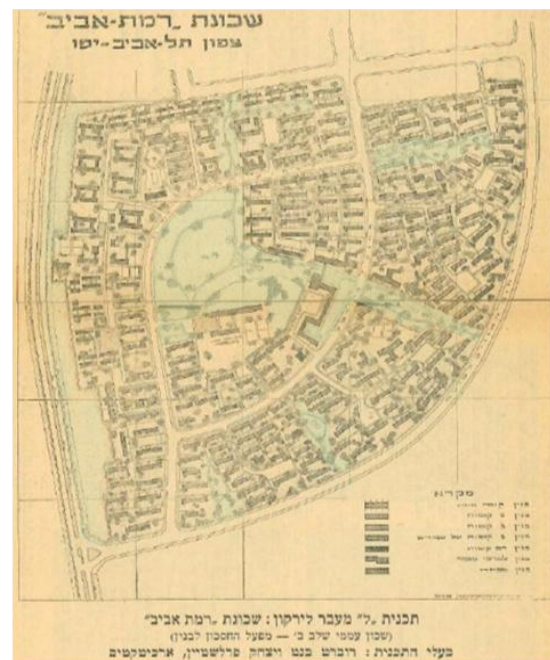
Connection plan between paths, plazas and public buildings in the open space
